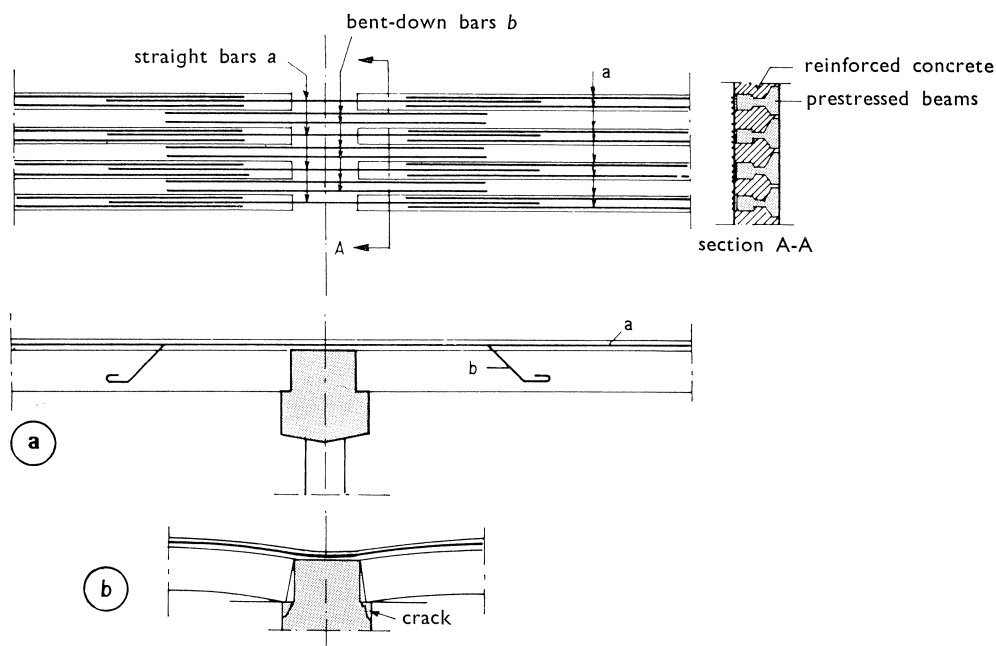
Bridge constructed from precast prestressed beams made structurally continuous over several spans; location of reinforcement over an intermediate support.
